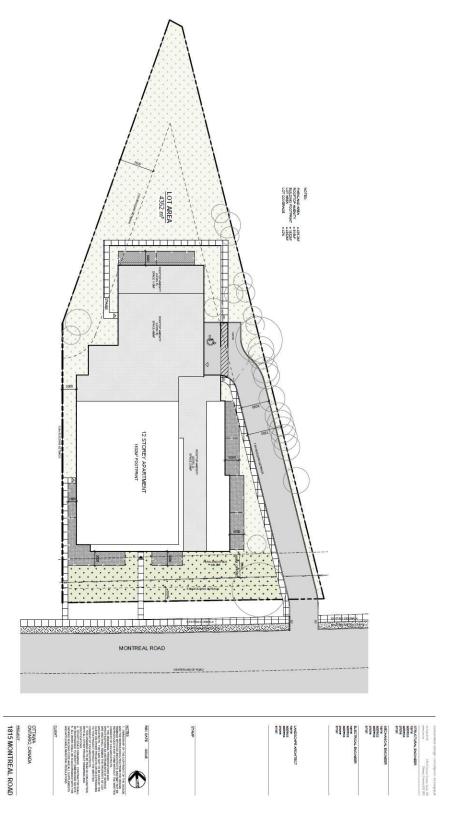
Concept plan, 12-storey high rise apartment, 131 units, 102 parking spaces
